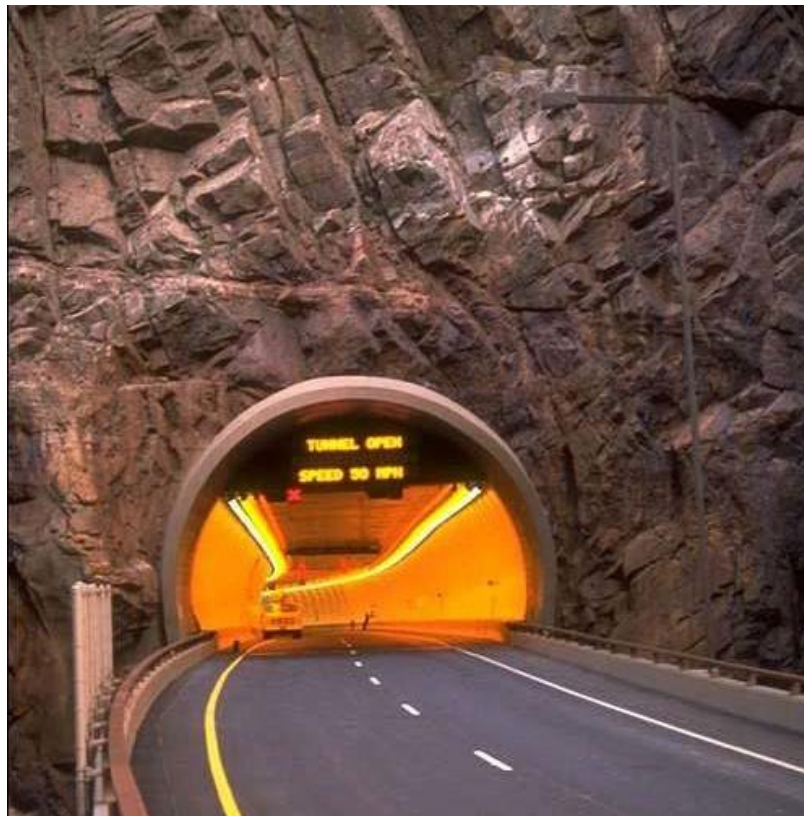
A Typical Horseshoe Section for a Two-lane Tunnel (Glenwood Canyon, Colorado)
